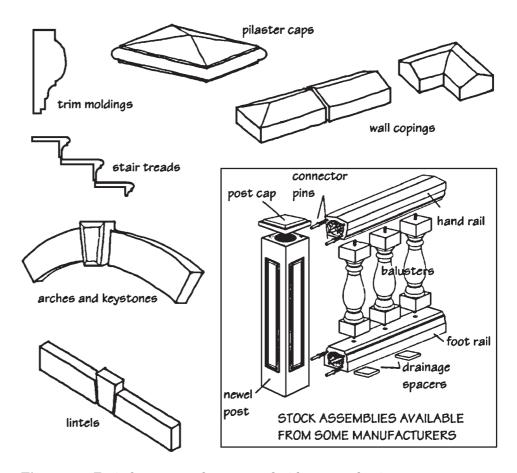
Typical cast stone elements used with stone and unit masonry.
